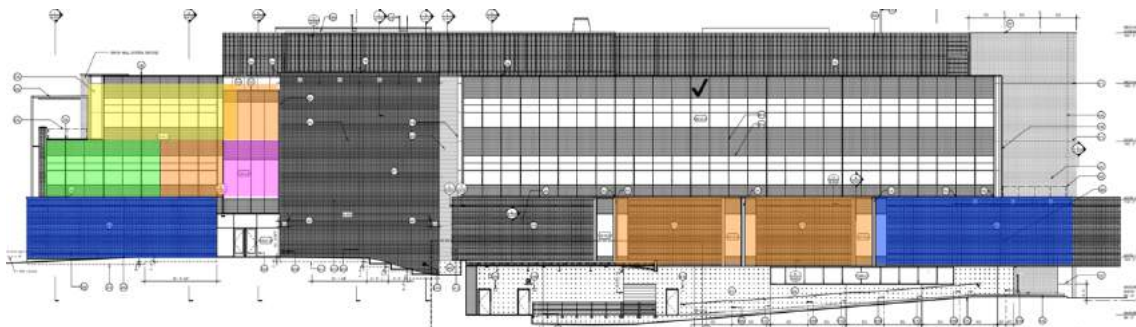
CoorsTek Center - South elevation (Source: Architectural plans)
